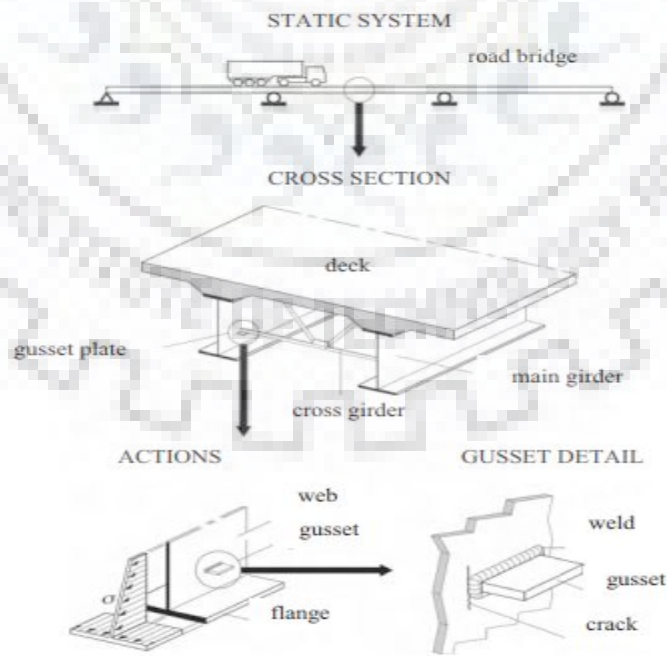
Location possible for fatigue crack in a steel & composite road bridge
